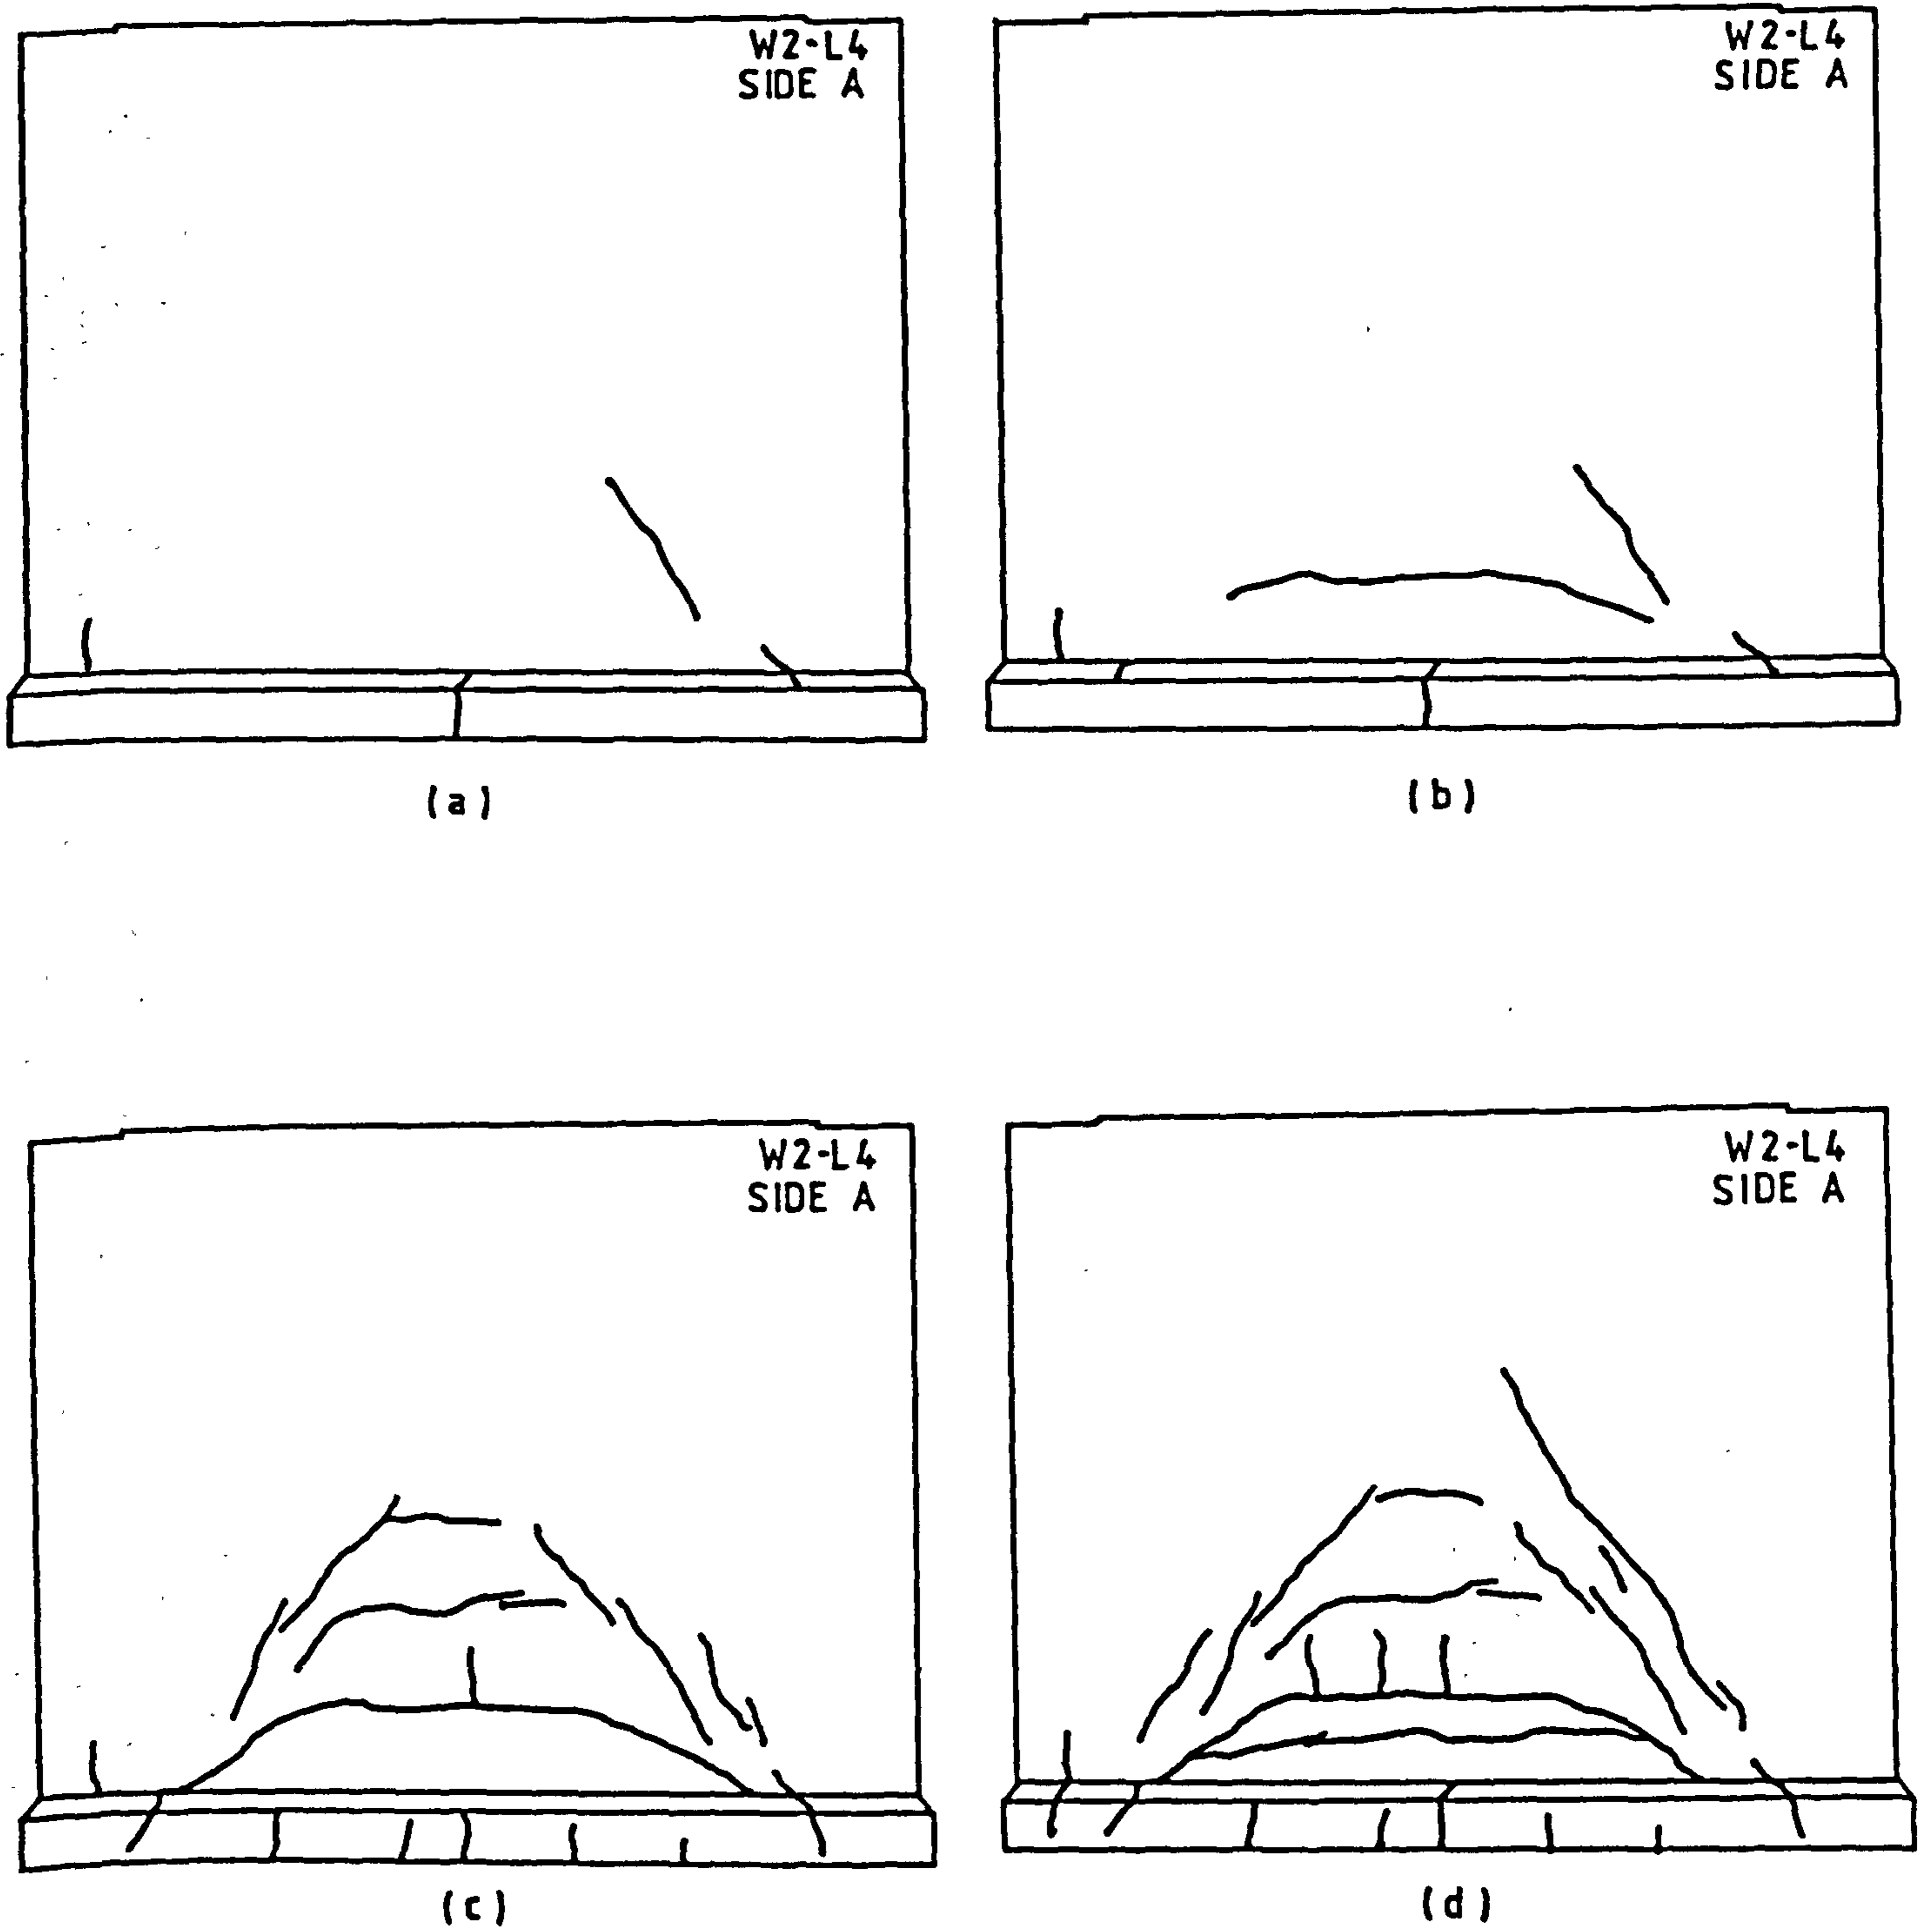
Development of cracks in wall W2-L4
